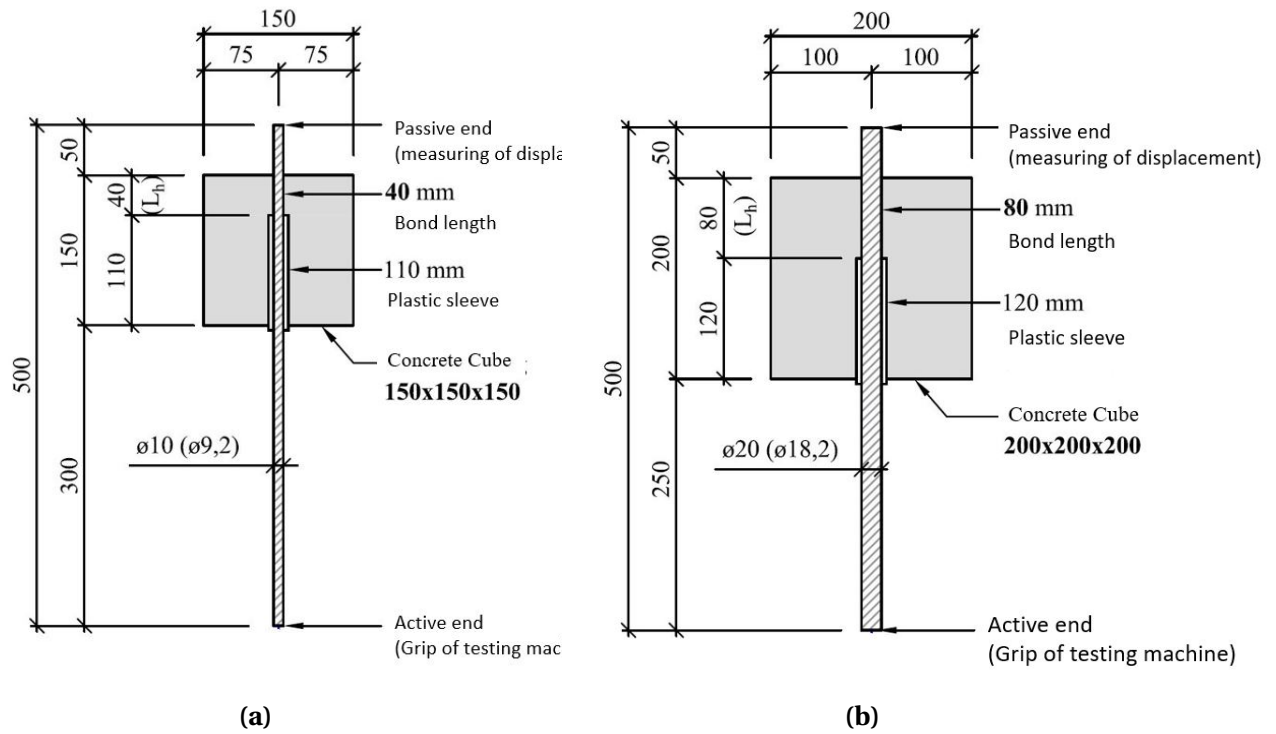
Aluminium rebars cast in concrete.
